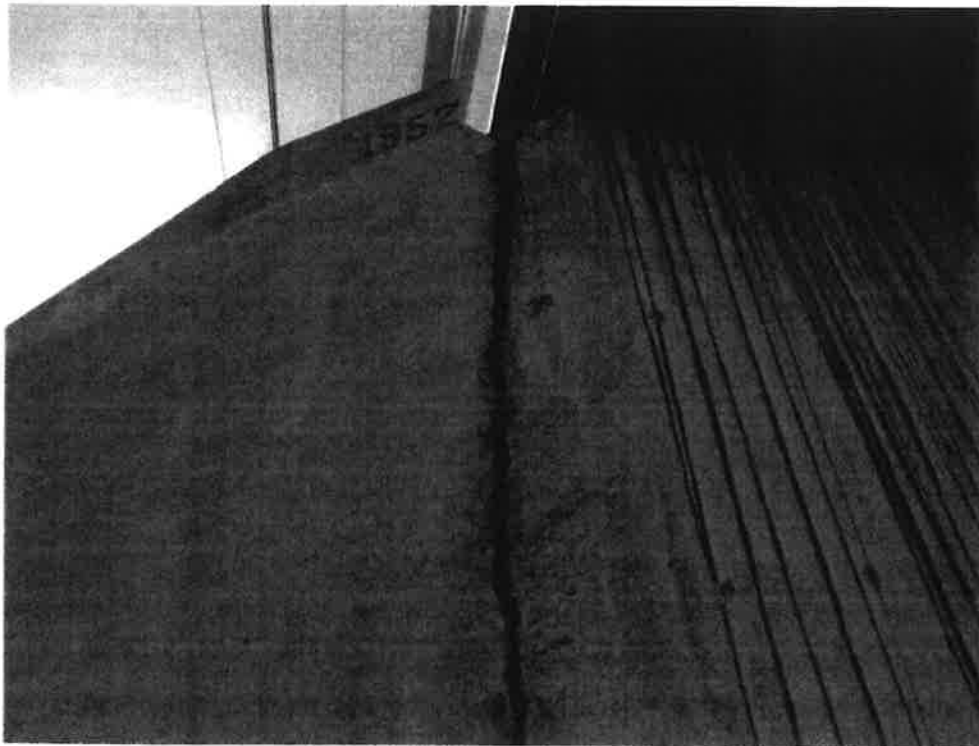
Northwest Corner, Large crack and demolished top of wall
